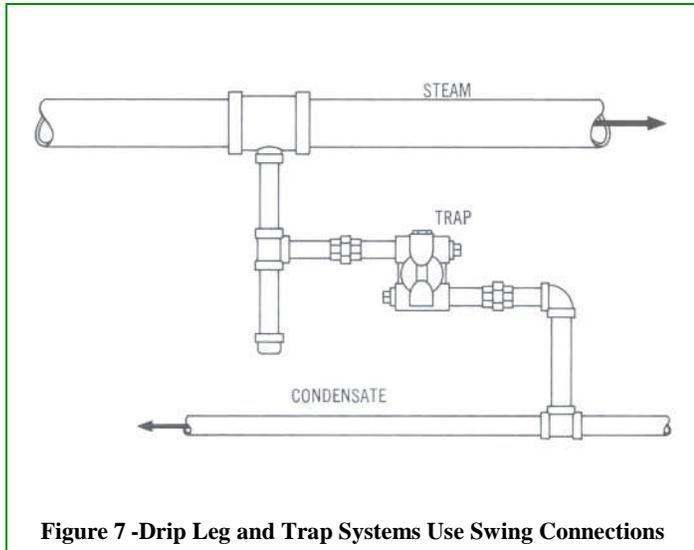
Drip Leg and Trap Systems Use Swing Connections
